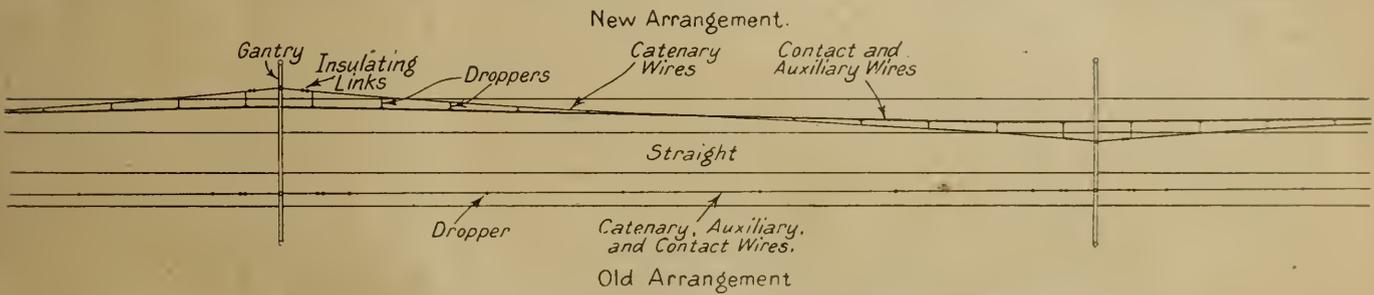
PLAN OF OLD AND NEW ARRANGEMENTS ON A STRAIGHT STRETCH.
